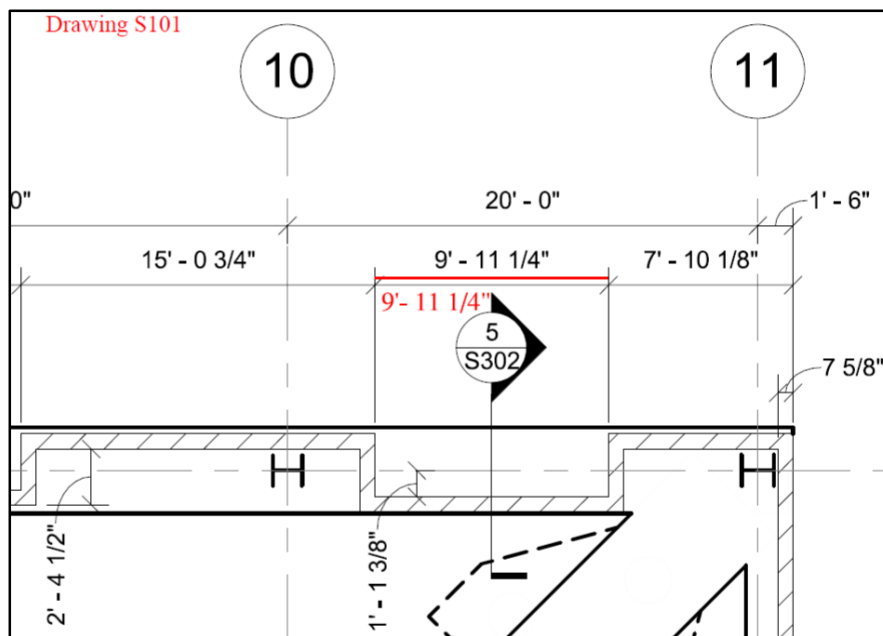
RFI 166 - Conflicting Structural and Architectural Dimensions on Entrance Returns – Turner Construction
